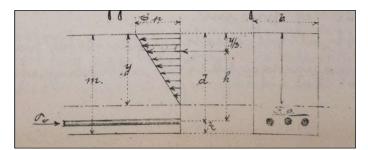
Distribution of stresses in reinforced concrete in case of simple bending [5]
